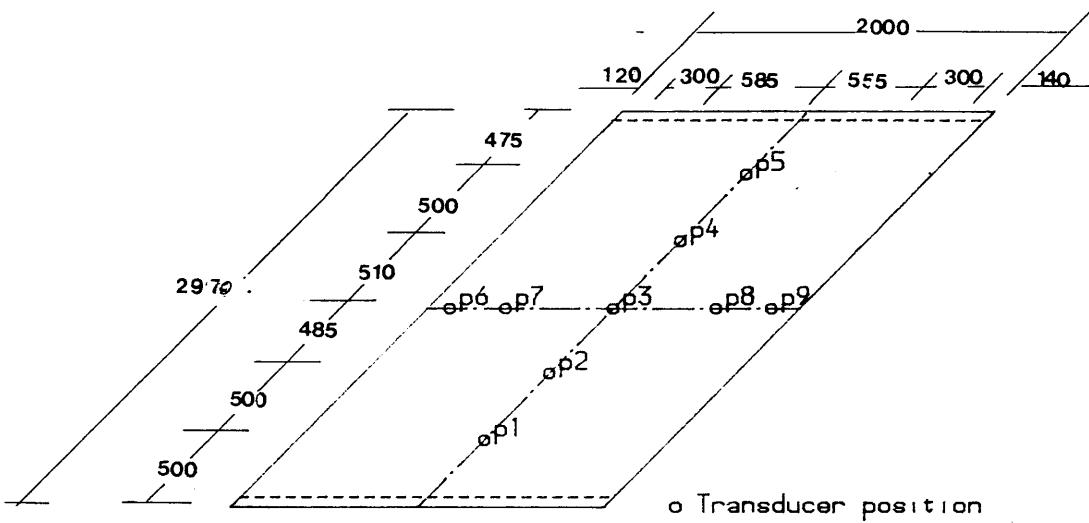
MODEL SKEW SLAB NO. (4) Location of transducers on upper
